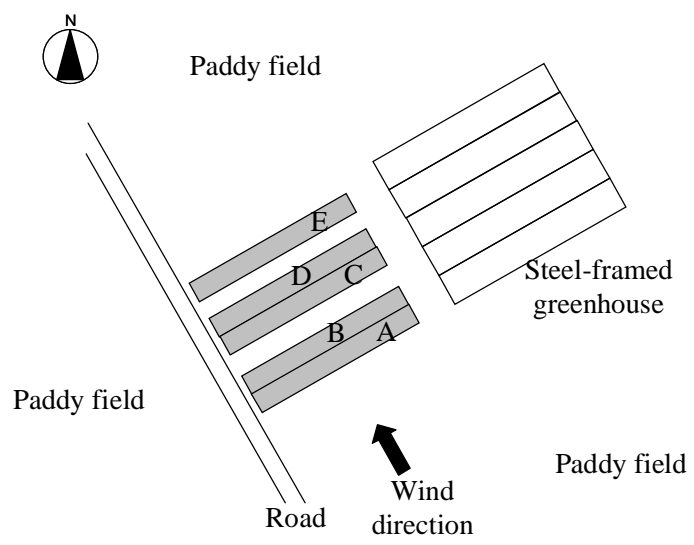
Plain view of pipe houses constructed in open and flat ground.
